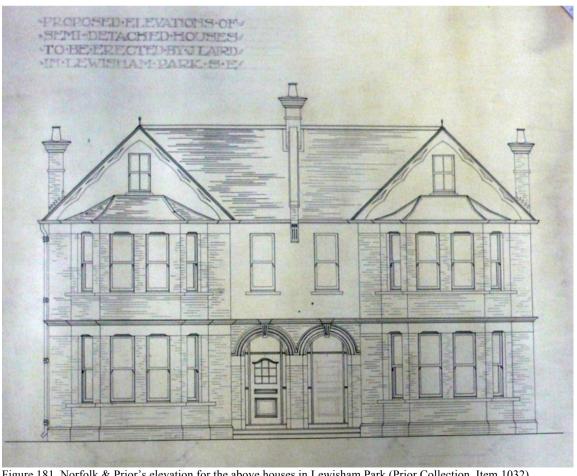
Norfolk & Prior's elevation for the above houses in Lewisham Park (Prior Collection, Item 1032)
